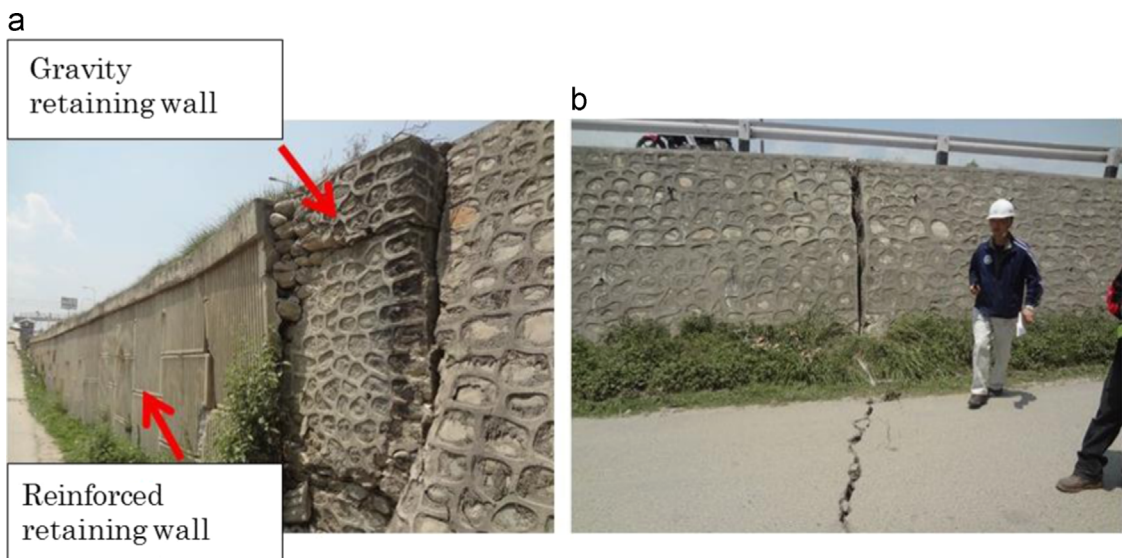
Retaining wall damage and ground fissuring. (a) Damage to gravity retaining wall and (b) ground cracks.
